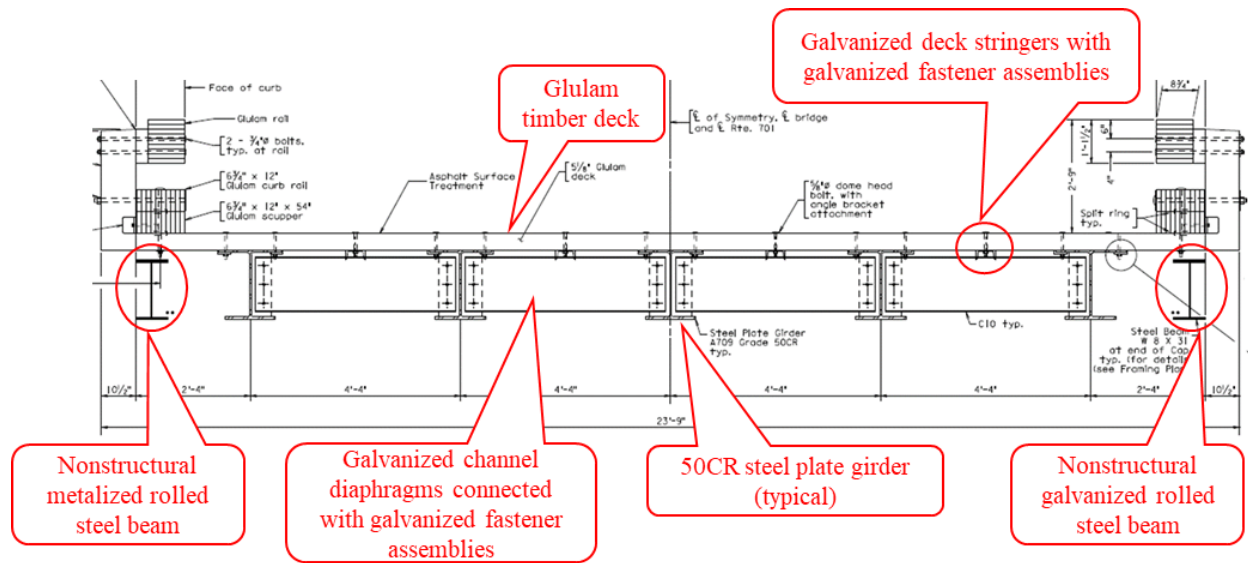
Typical Cross Section of the 2022 Holdens Creek Bridge
